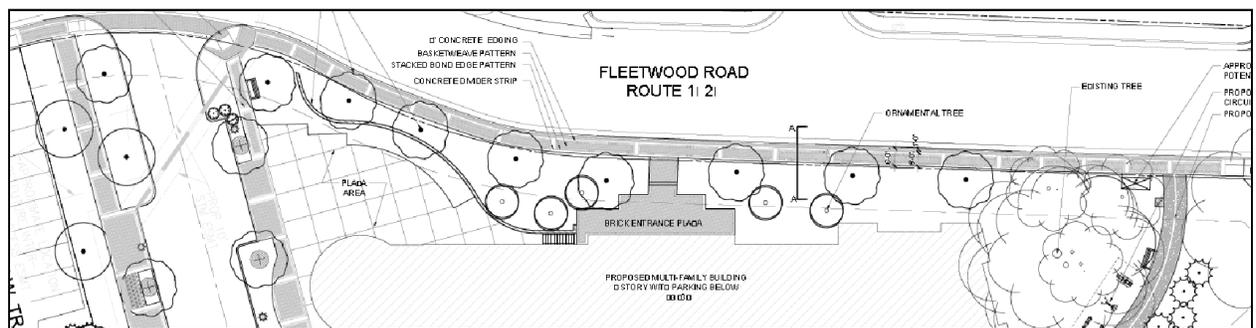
The Fleetwood Road streetscape (Source: Bowman Consulting, June 1, 2014)
